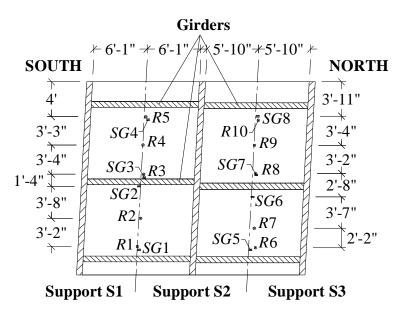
LVDT and Strain Gage Positions in the Load Test after Strengthening
